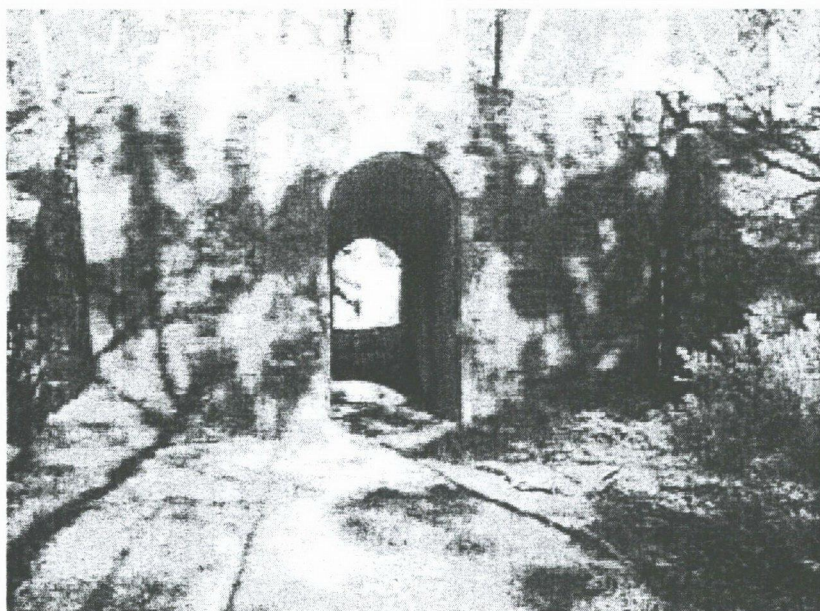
Culvert 6, view of north face. Arch height 3.67m and width 1.58m.
